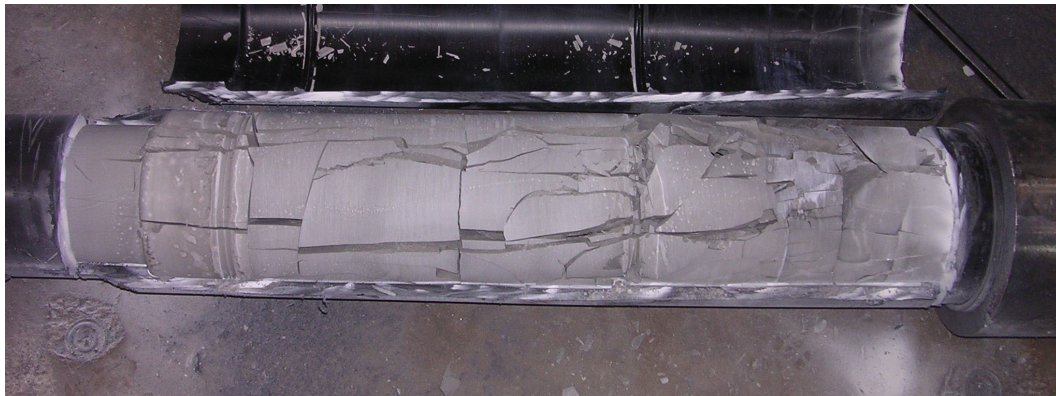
Grout at deck end immediately after opening - Specimen 10
